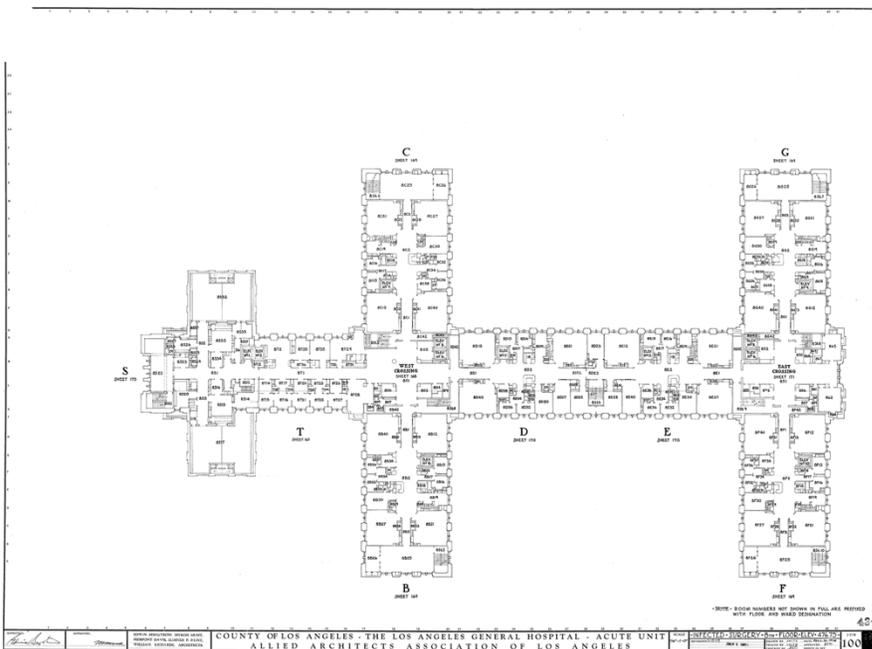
Original drawing showing typical upper floor plan, eight floor shown, 1928, revised 1929; Allied Architects Association of Los Angeles
